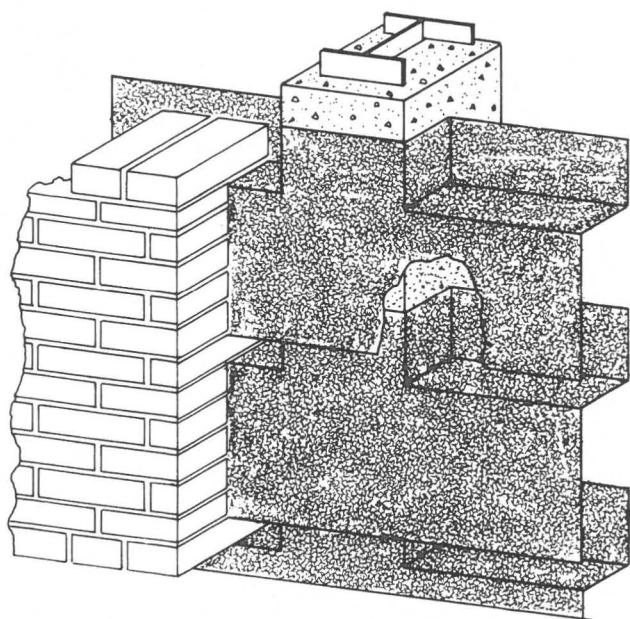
Larson Waterproofing system—sheathing of exterior columns
